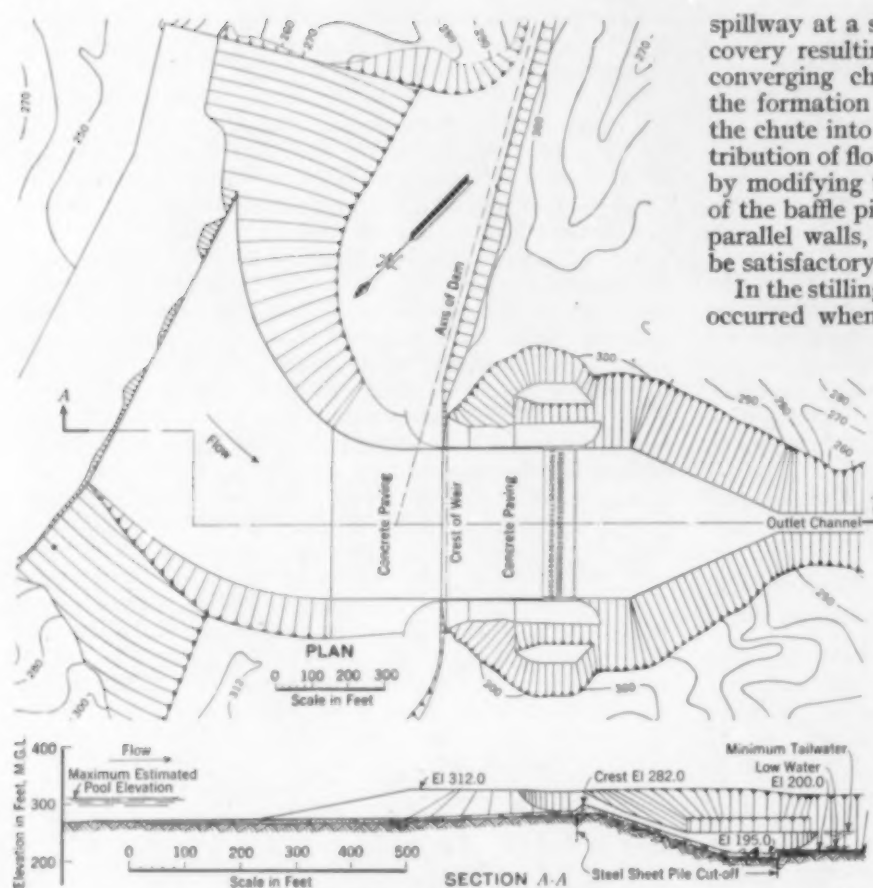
PROFILE AND PLAN OF SPILLWAY
